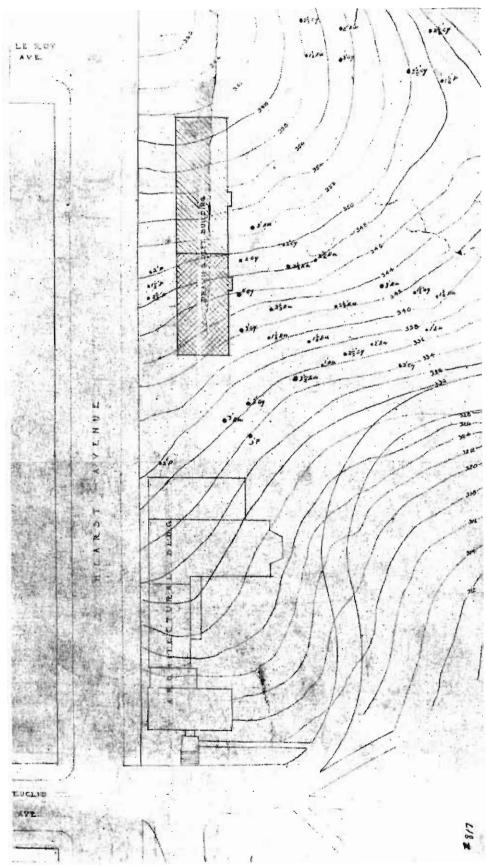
Site Plan (JGH, 1918) Bancroft Library, UC Berkeley
